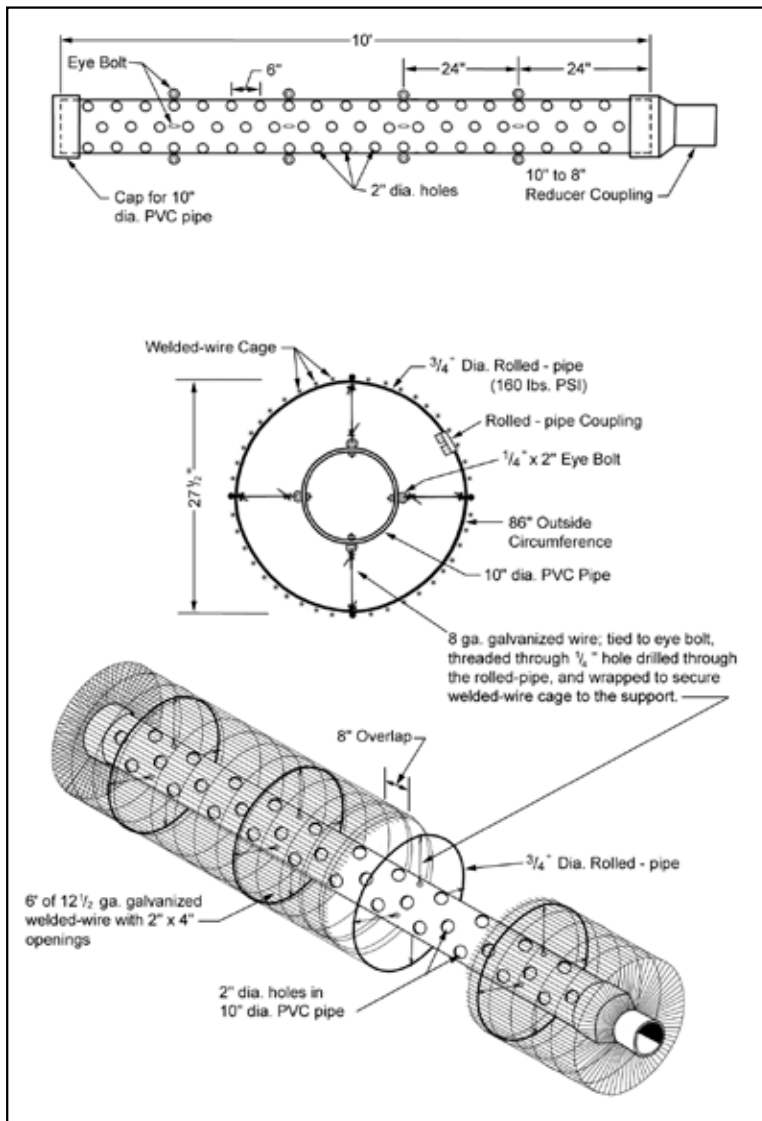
A Clemson beaver pond leveler to control water level and/or provide bypass flow to plugged culverts and beaver dams. (Wood et al. 1984) (Note: Metric units were not available on this drawing.)
